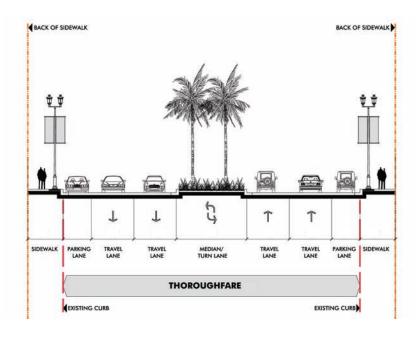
C.4: POTENTIAL CONCEPT STREET SECTIONS
